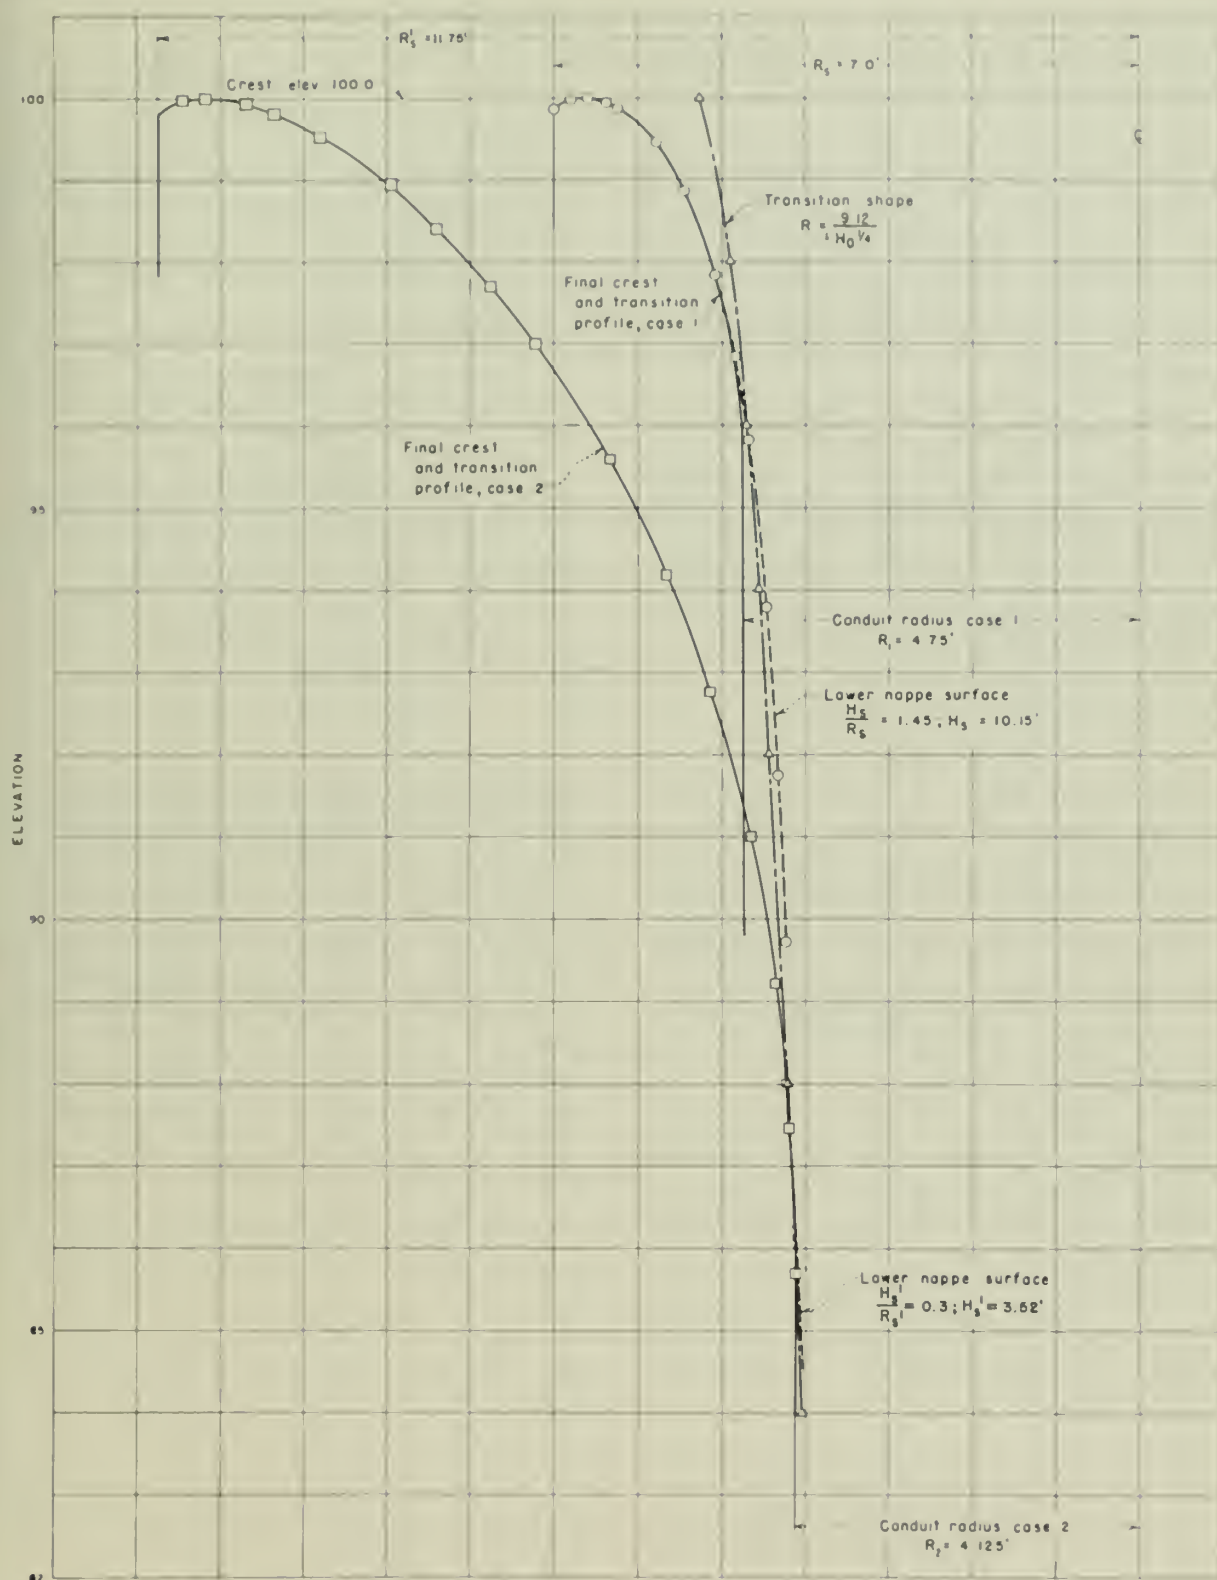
Drop inlet crest, transition, and conduit plottings for illustrative example.
